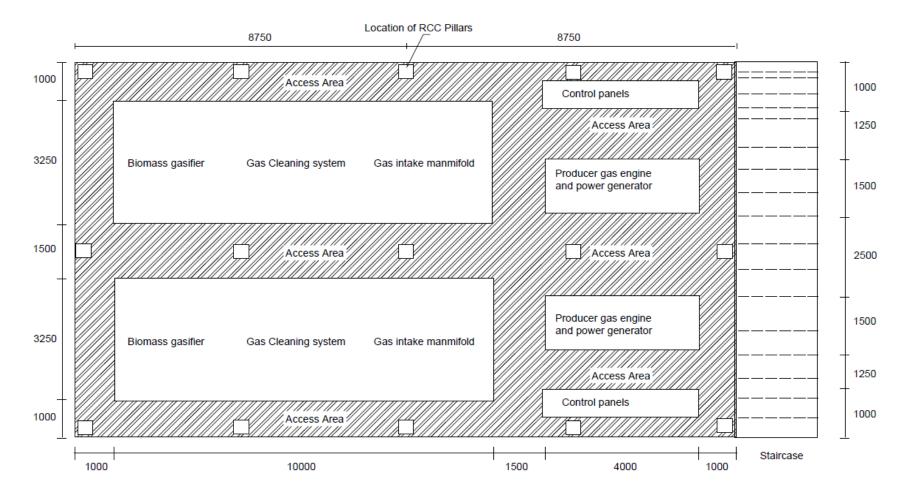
Civil structure required for the proposed biomass power plant: Plan
